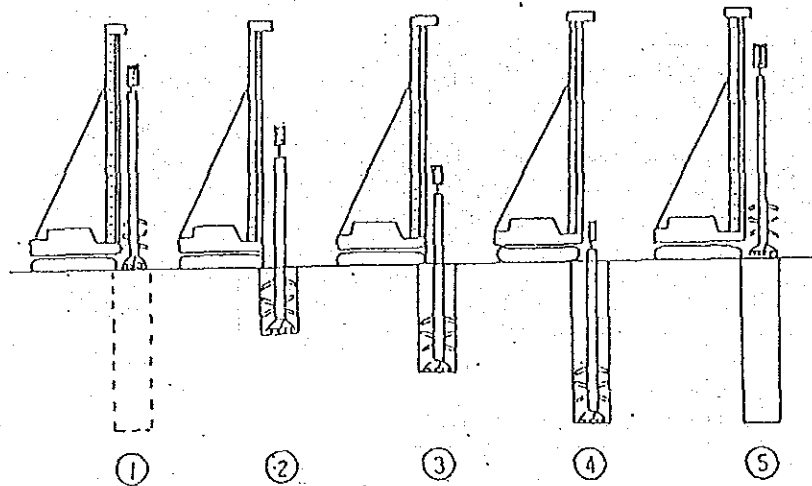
Typical Arrangement of Construction Equipment for Soil Cement Columns
